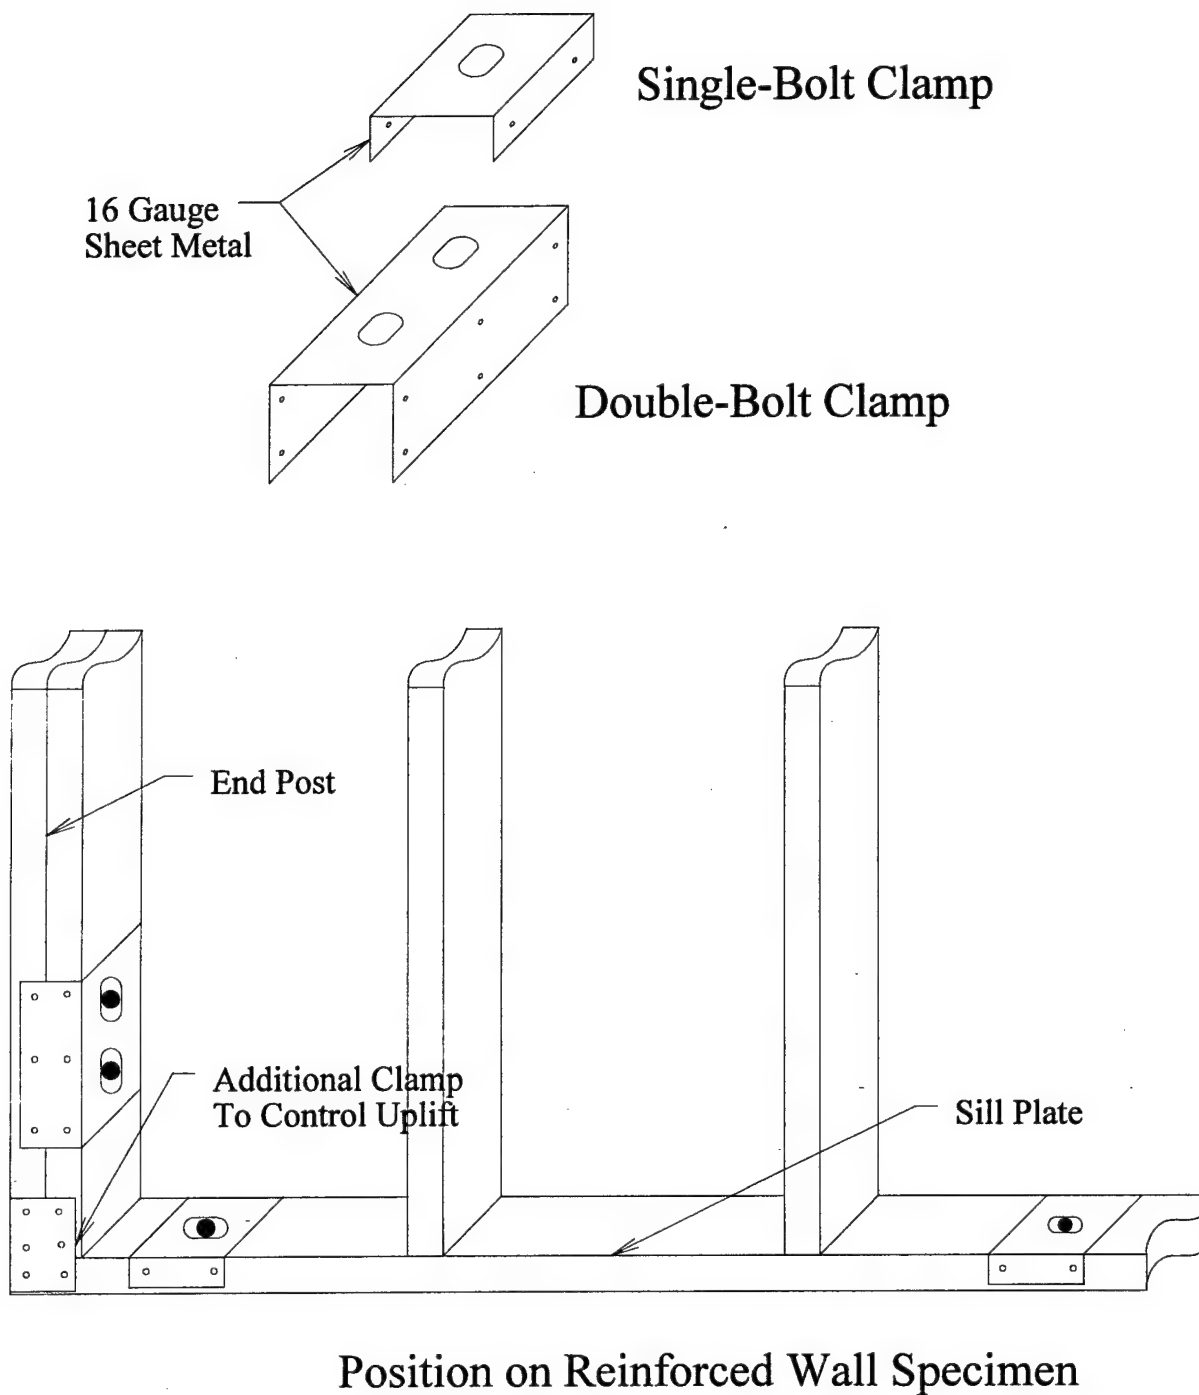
Confining Clamps -- Task 2: Full Scale Plywood Shear Wall Testing
